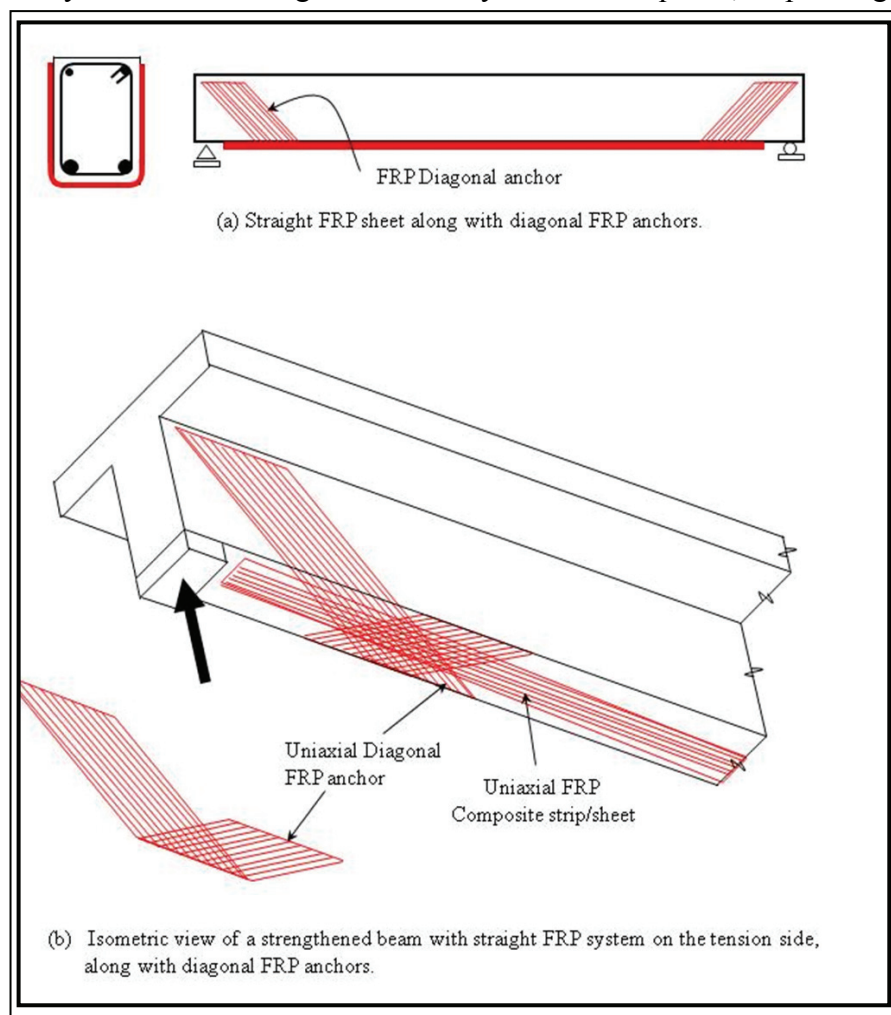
Retrofit of Bridge Girder with FRP Composite Sheets (Aboutaha, 2004)
